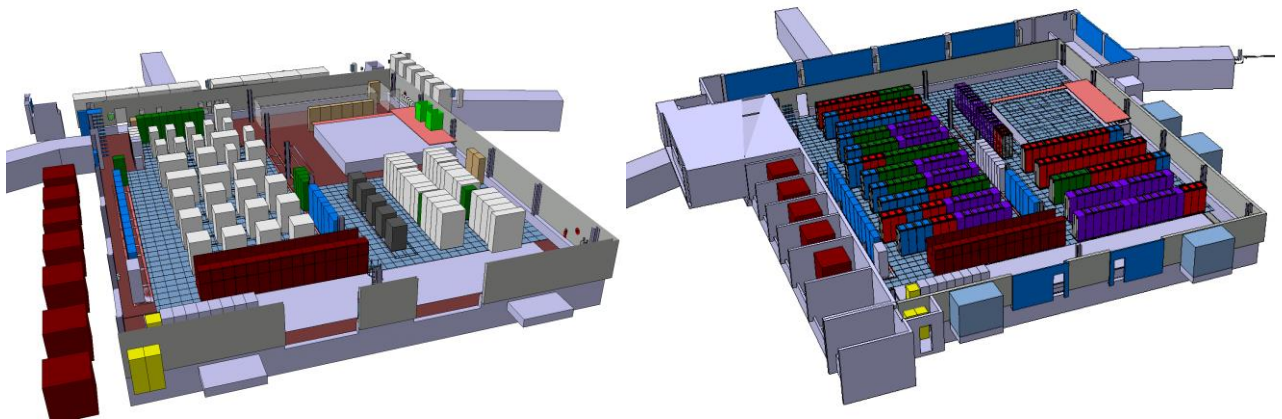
Configuration of Building 251 before (left) and after (right) renovation.
